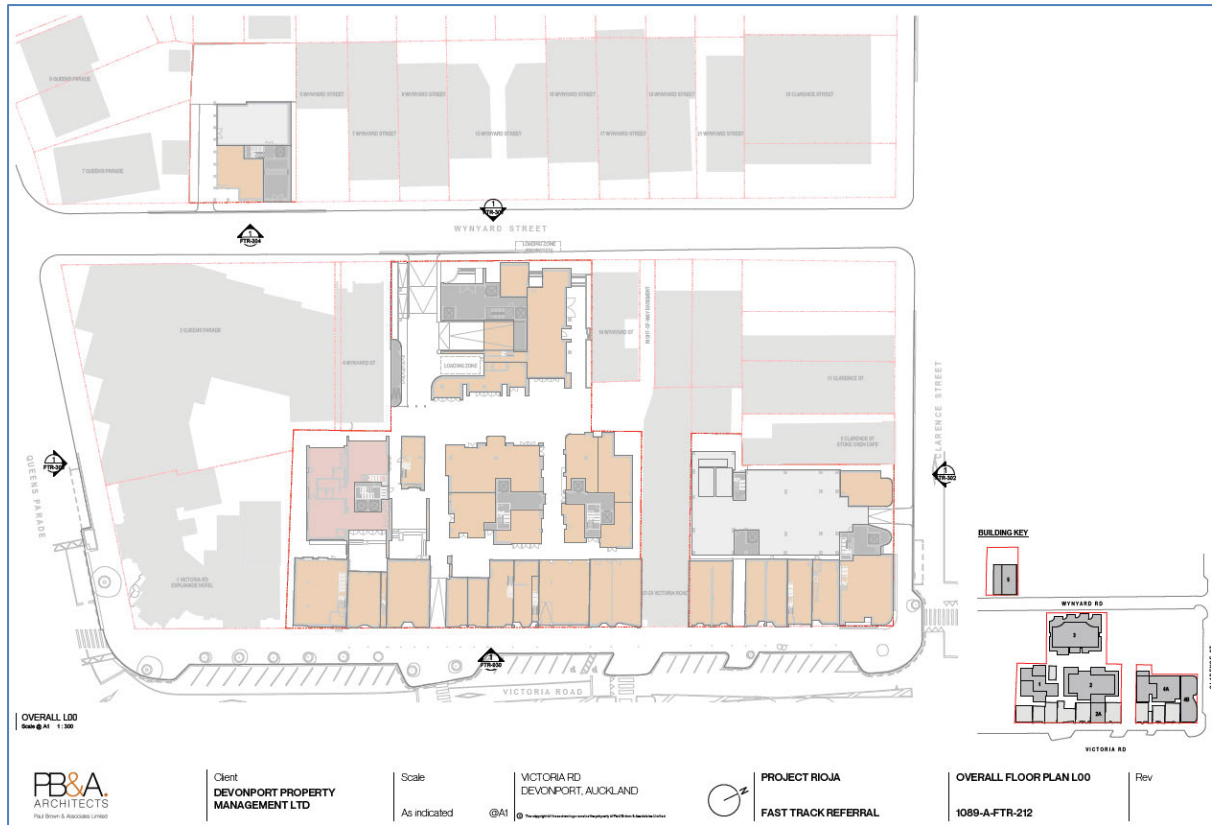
Overall ground floor plan - some subsurface archaeological features might be impacted.
